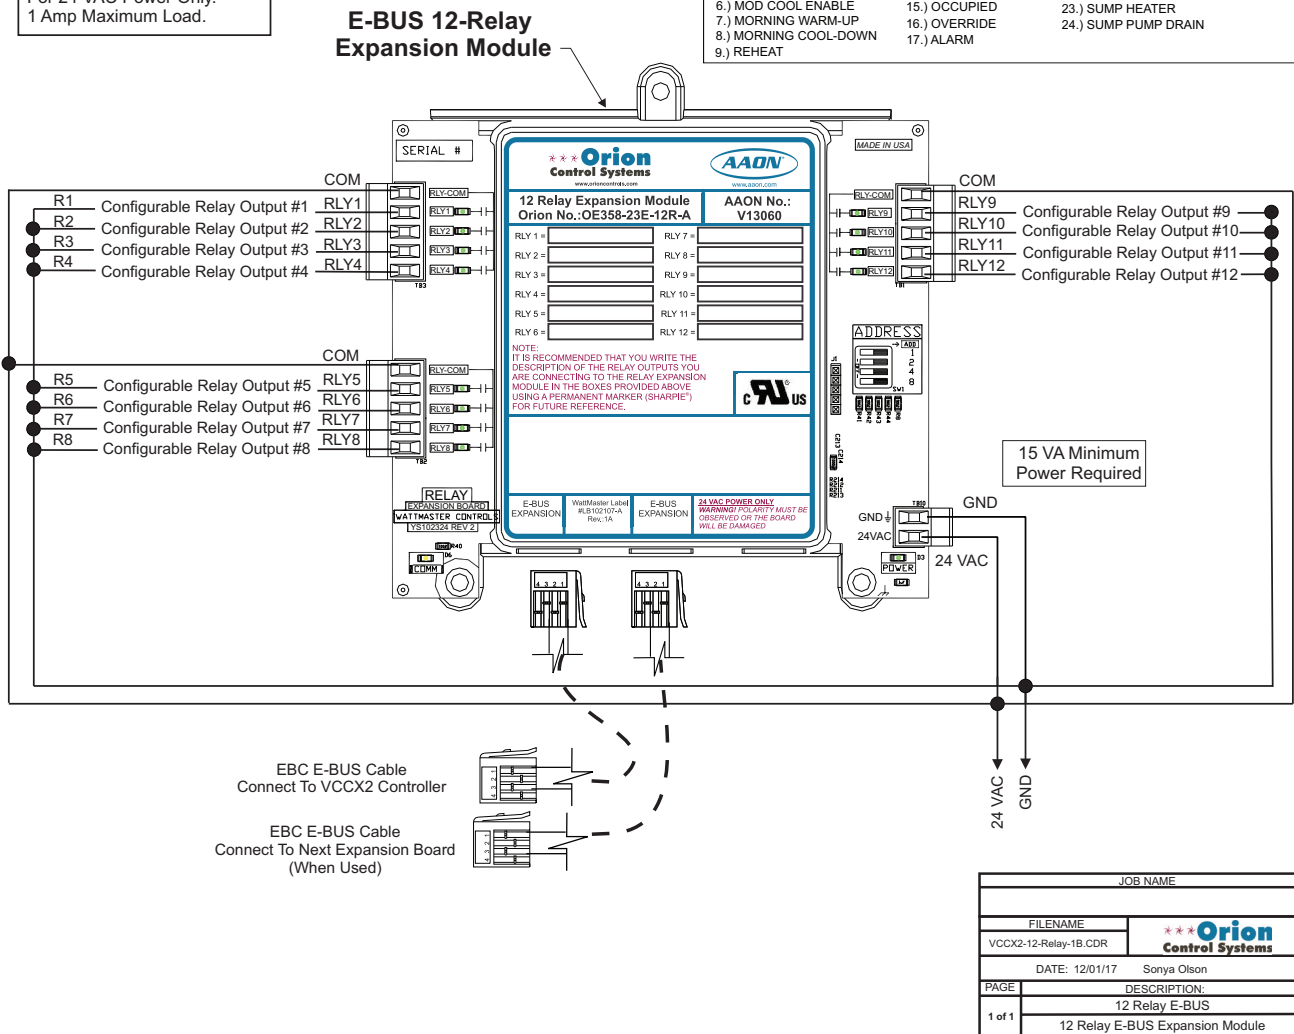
OE358-23E-12R - 12 Relay E-BUS Expansion Module Wiring
